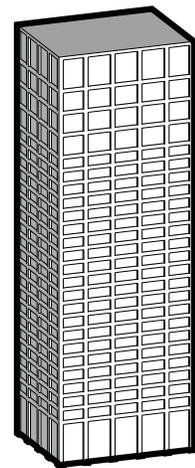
FAÇADE ARTICULATION TOWER EXAMPLE
